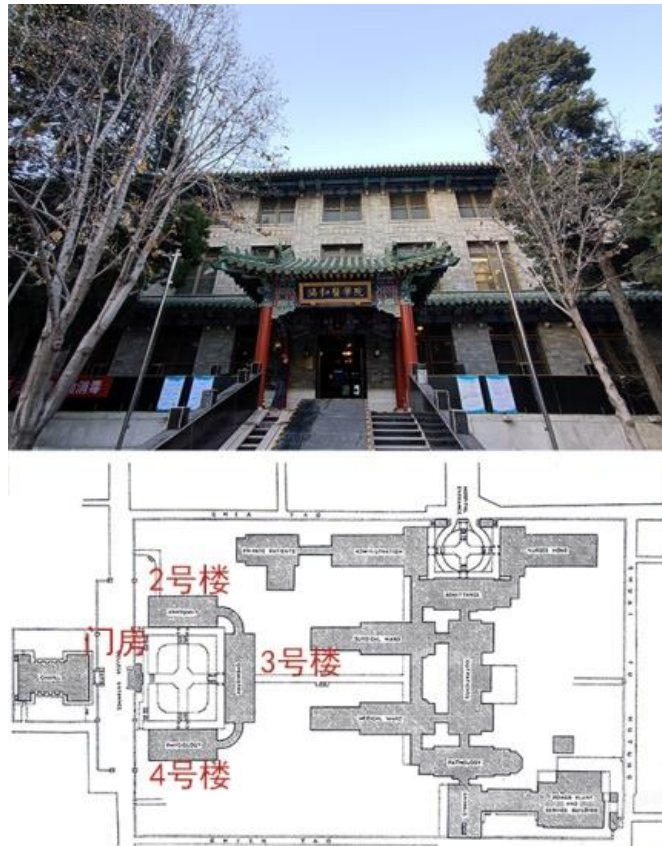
Union Medical College buildings and overall layout Clockwise: Building 2, Building 3, and Building 4.
